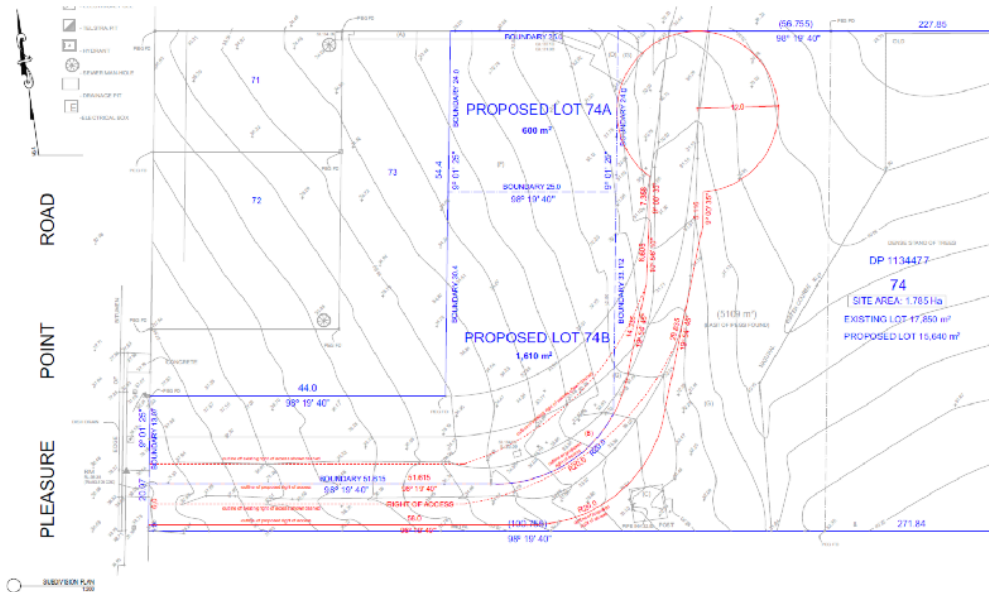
Proposed Subdivision Plan DA-724/2016 (LCC E-Planning Portal)
